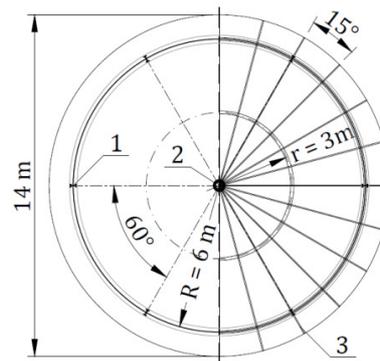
Top view of the house: 1 – external columns; 2 – central column (building core); 3 – roof rafters
